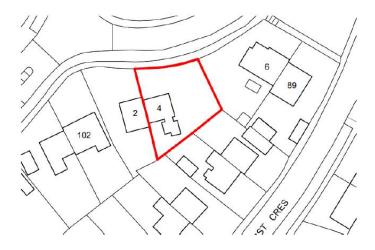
plan of current dwelling at 4 Keymer Road (p.2 in Planning Statement)
